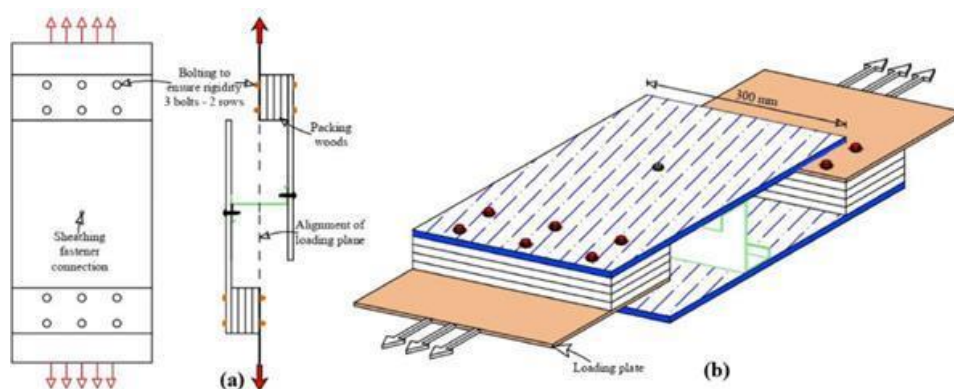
New setup to determine the strength of the sheathing fastener connection against the twist of the point symmetric shaped CFS stud. [16]
